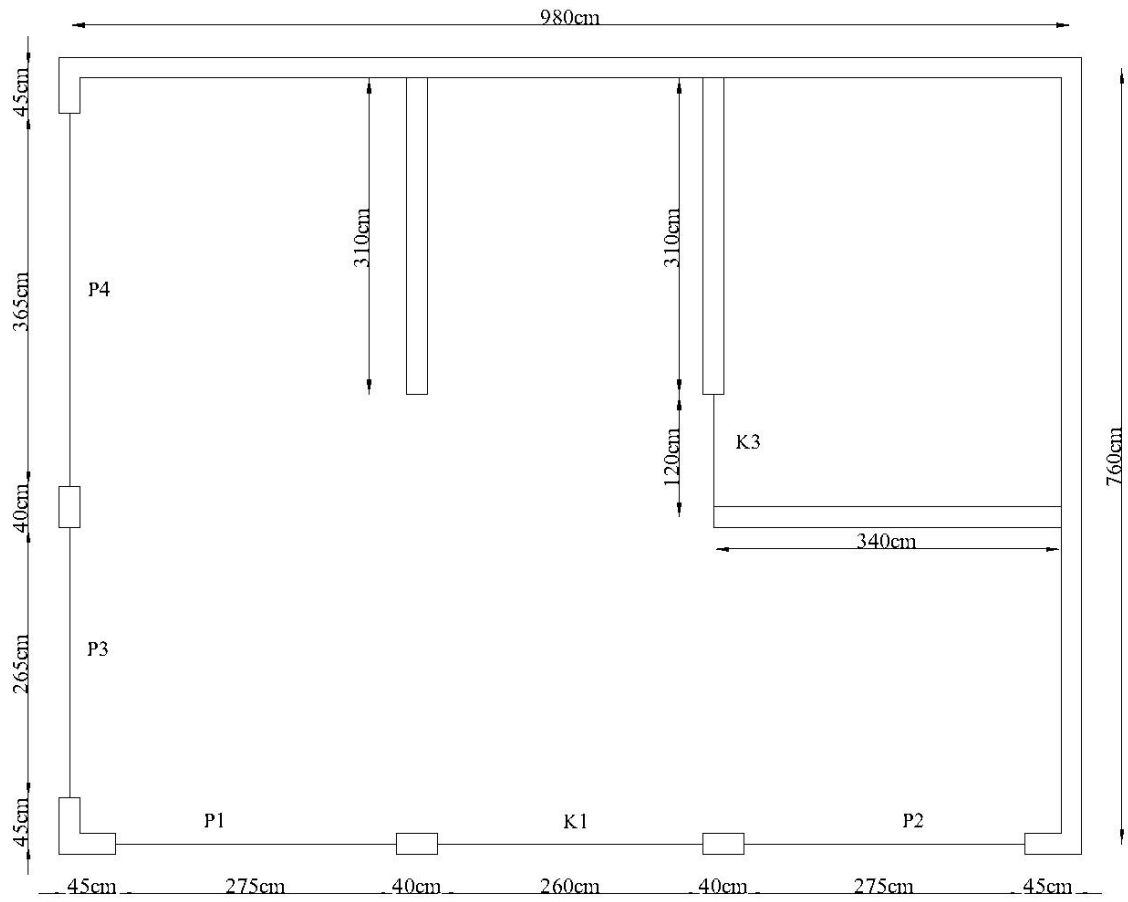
6. Plan geometry of the masonry building model of R2W3 subclass.
